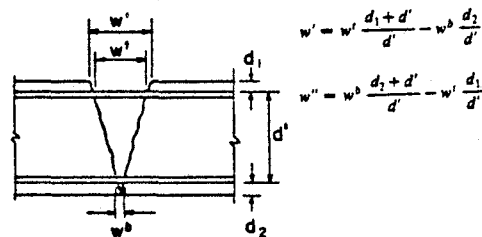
COMPUTATION OF CRACK WIDTH AT THE TOP AND BOTTOM OF A CRACKED R/C SECTION
